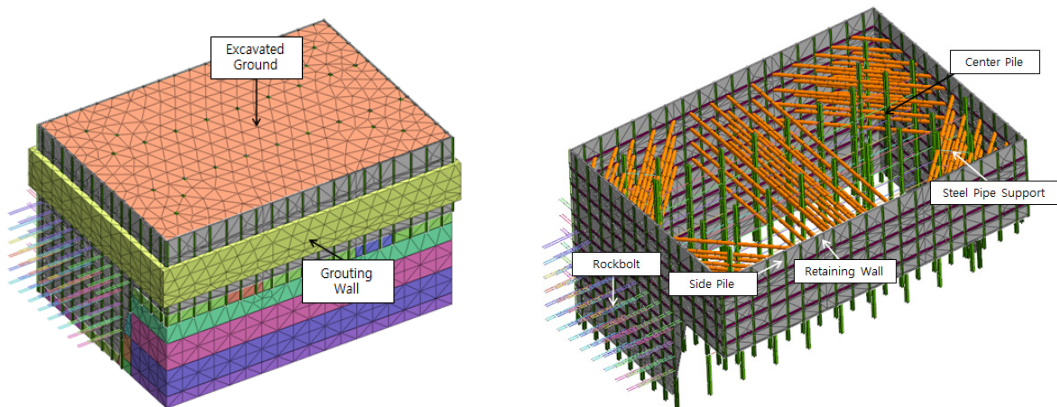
3D analysis modeling for earth retaining wall and support structure
